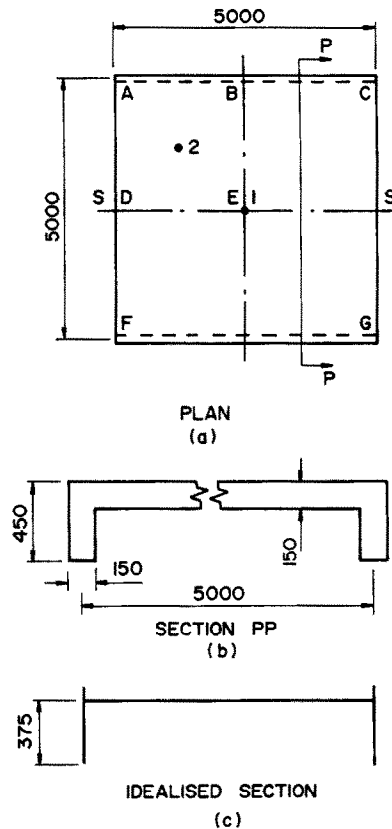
Beam supported slab (all dimensions in millimetres). S = simple support.
